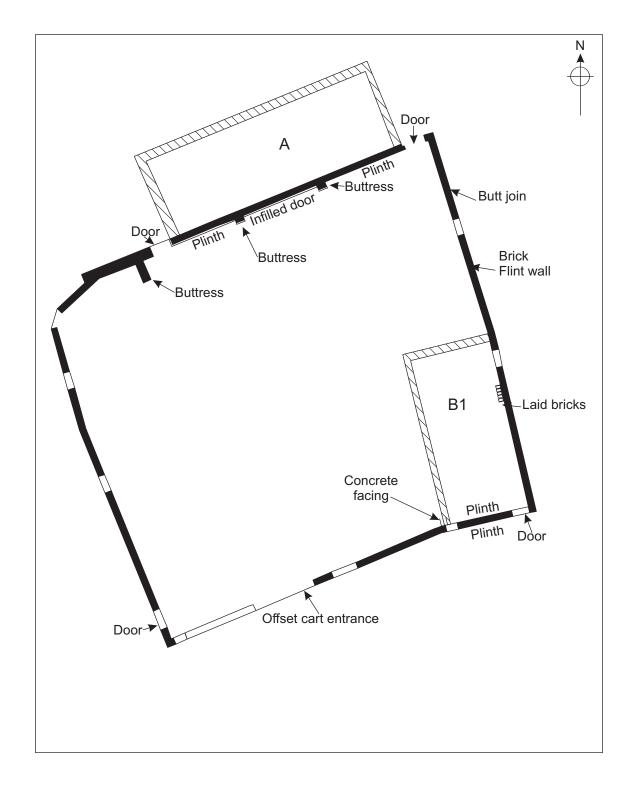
Plan of aisled barn, annotated, with former buildings A and B1 shown. Scale 1:200
